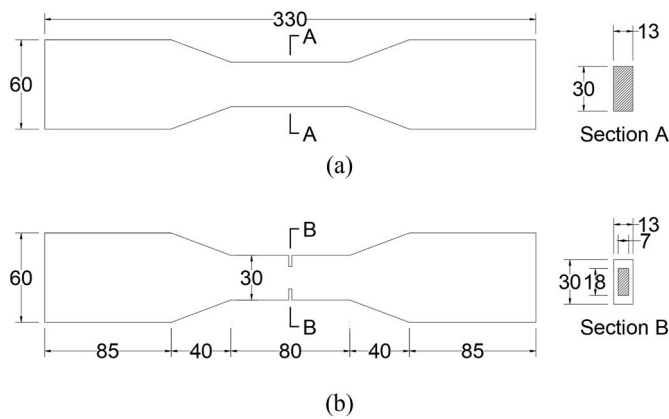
Dimensions of dogbone-shaped specimen for (a) uniaxial tension and (b) single-crack test (unit: mm).
